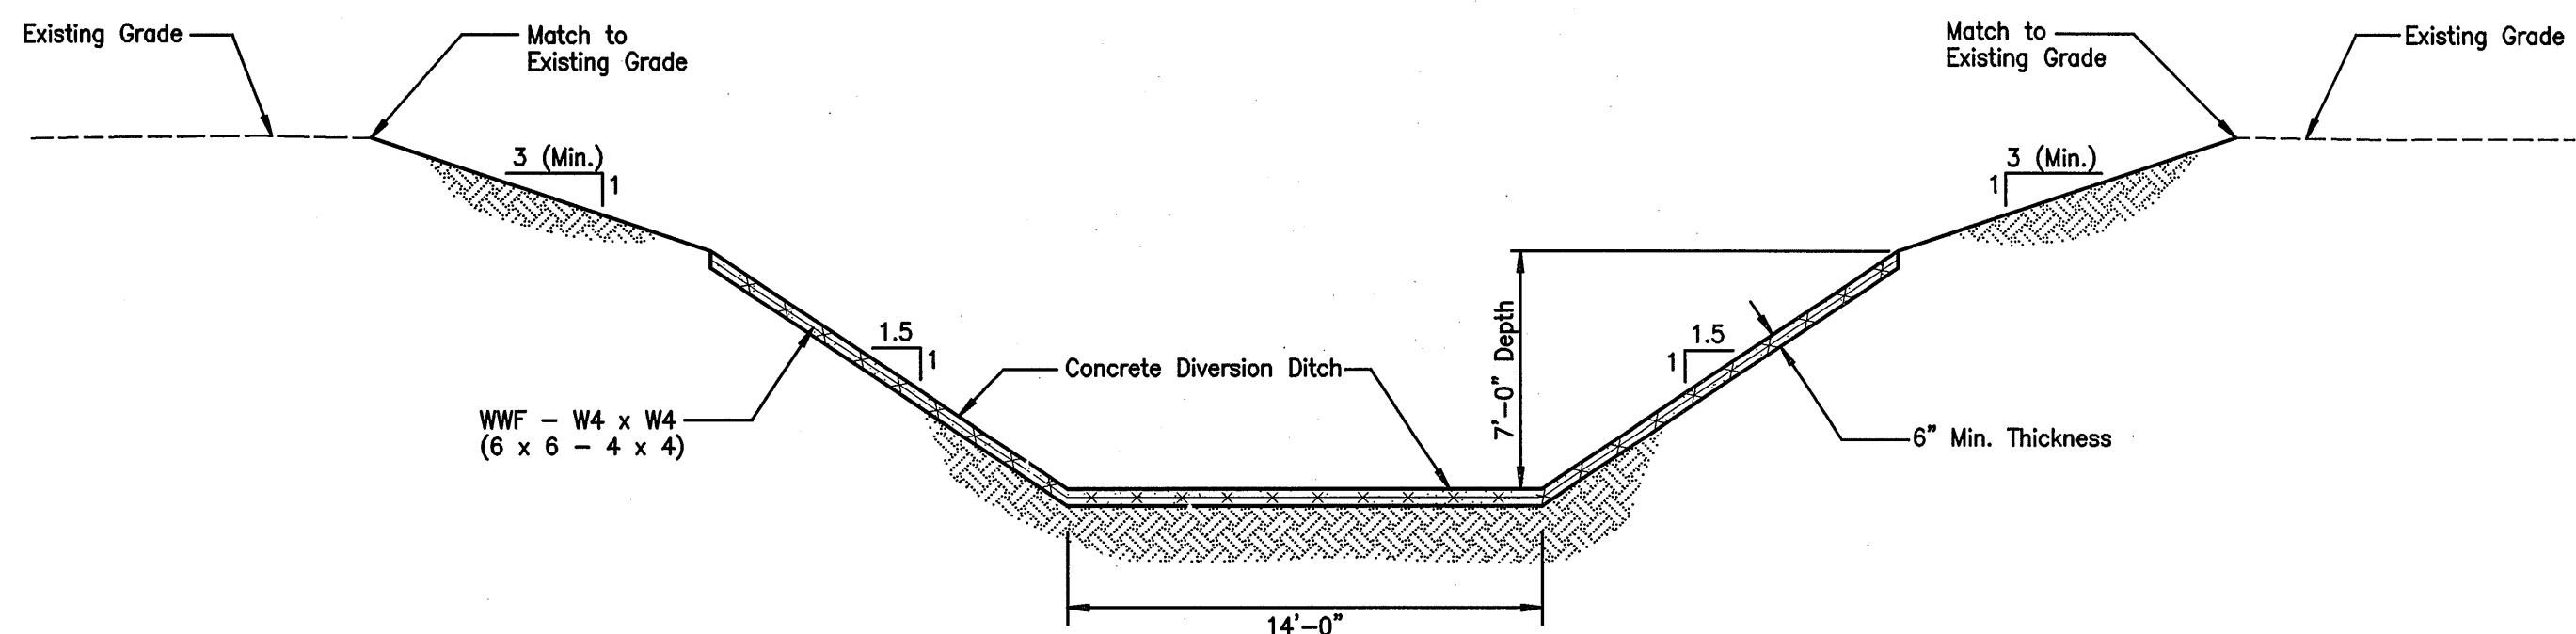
" REINFORCED CONCRETE PAVEMENT
